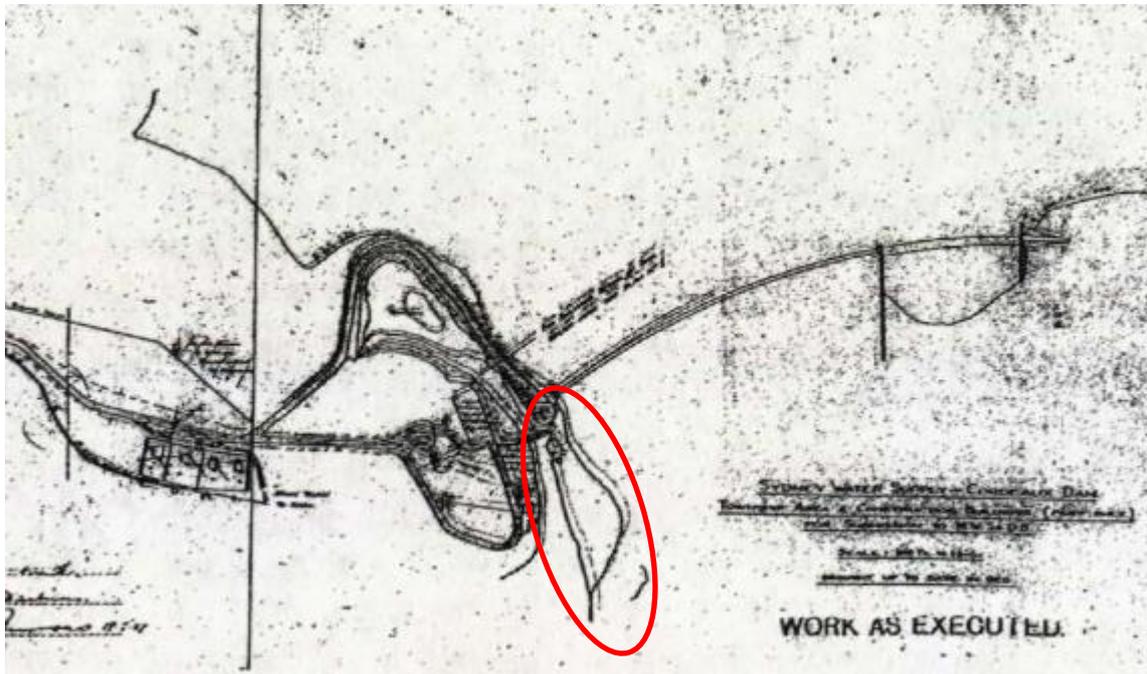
Detailed plan showing the roads and tramways from the workers' township around the various work zones, quarry and between terraces. Study area circled in red.¹⁶
